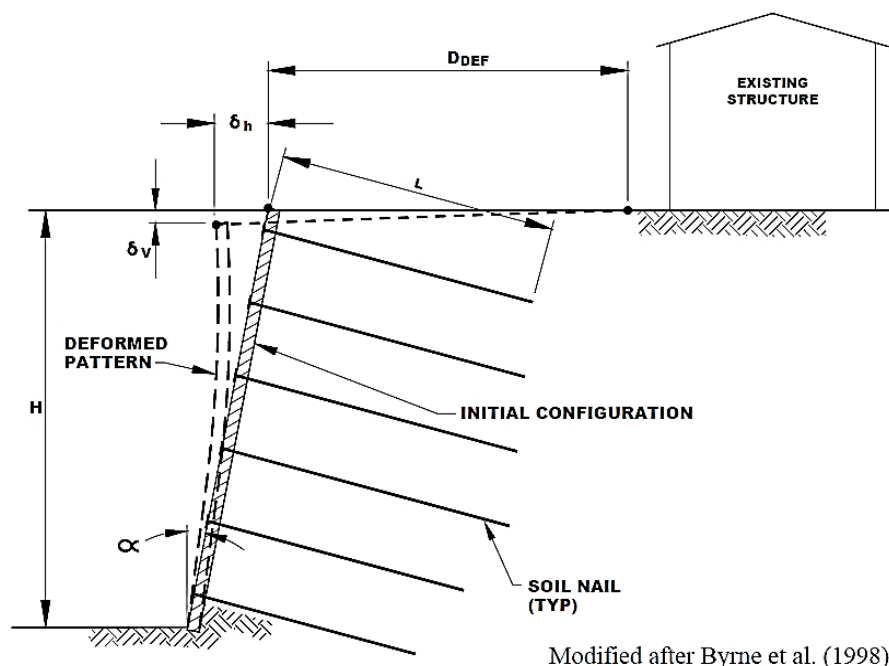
Deformation of soil nail walls (Lazarte et al., 2003)
